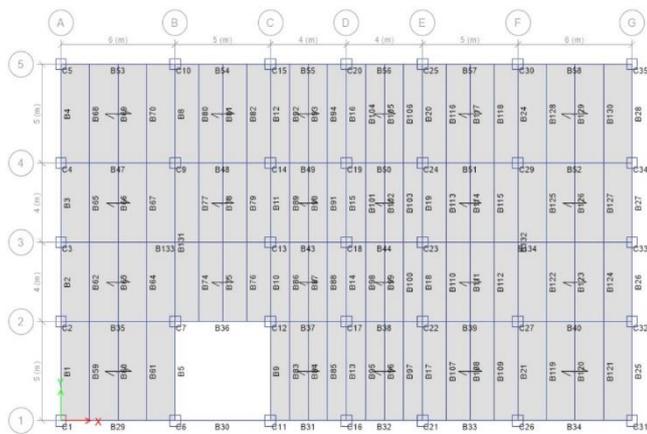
2D Plan View of Steel Model 4 At Storey 2
